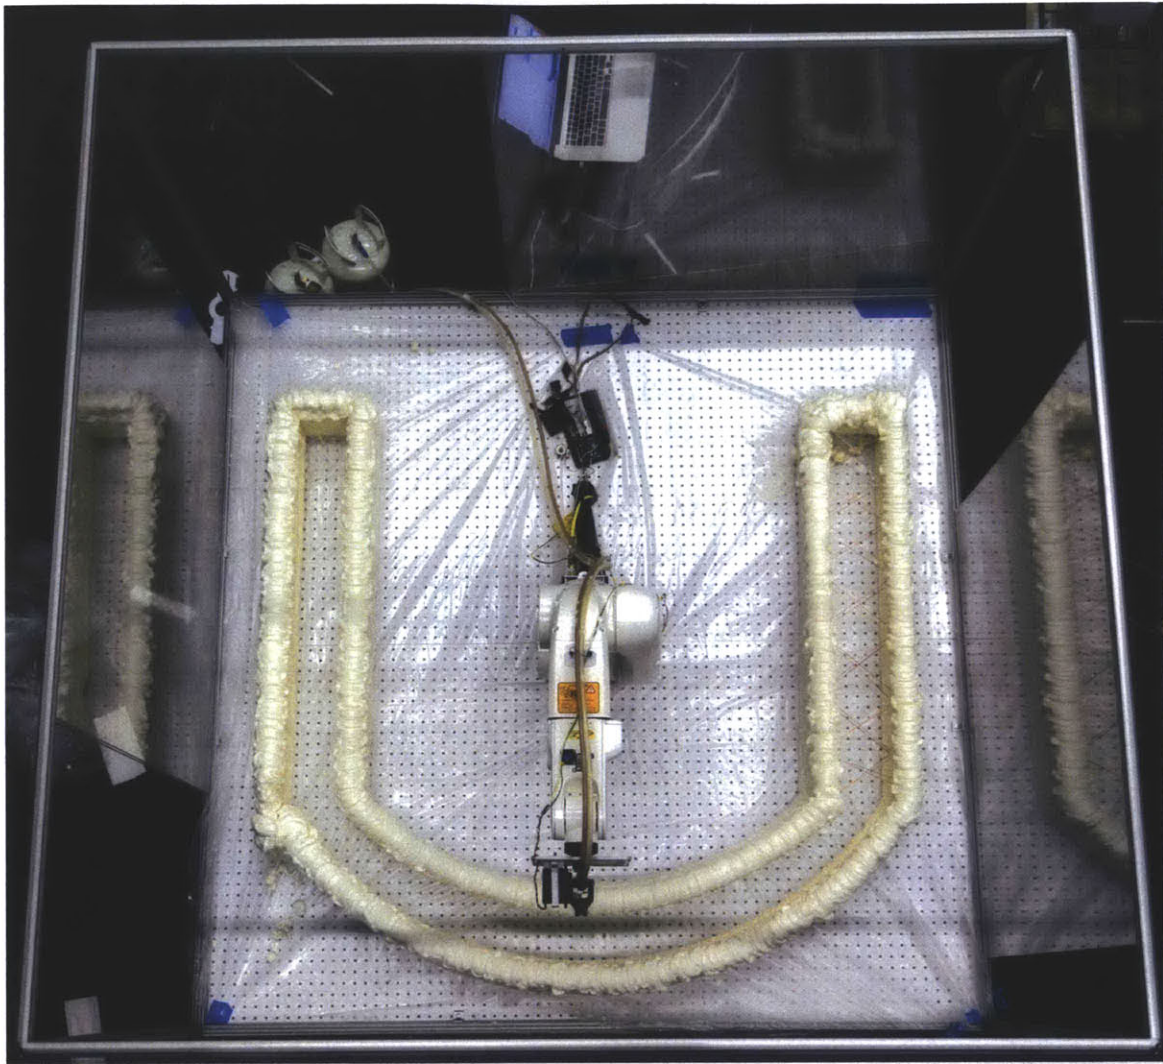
A curved wall mould is printed using the robotic arm platform (top view). The resulting polyurethane mould structure can be filled with a castable structural material and finished with traditional methods.
